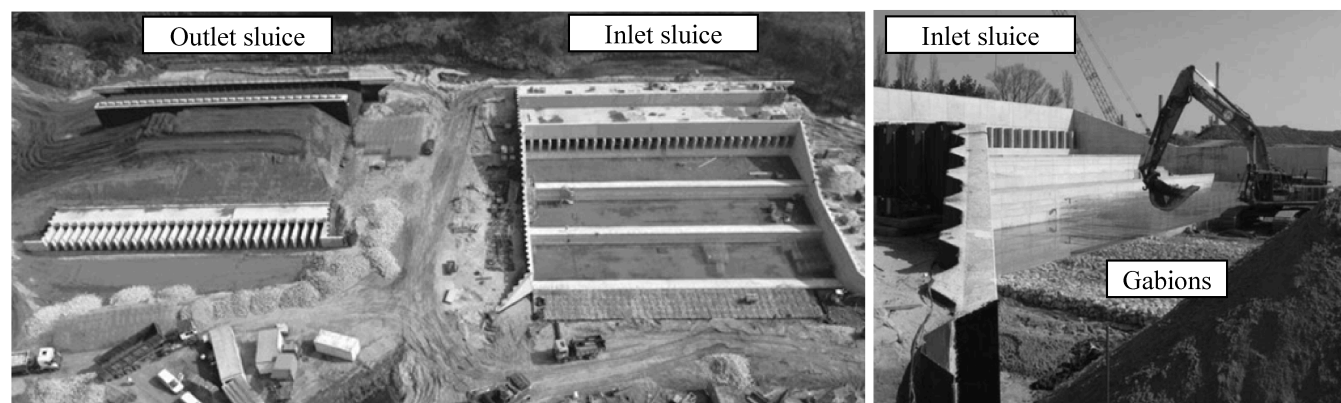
View upon outlet and inlet sluices (left) and bottom protection downstream of end sill inlet sluice (right) constructed at FCA-CRT Kruibeke
